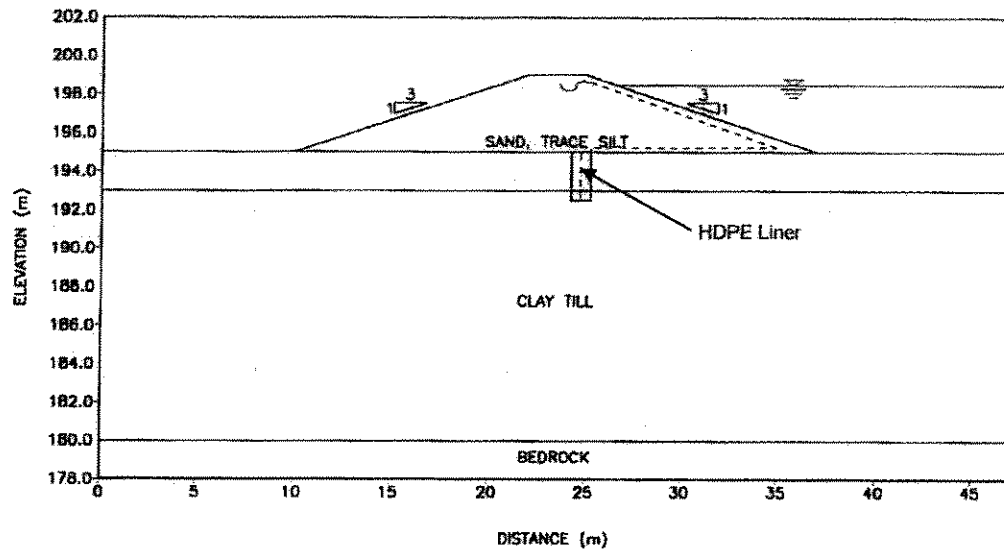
Proposed Layout of HDPE Liner (Option 1)
